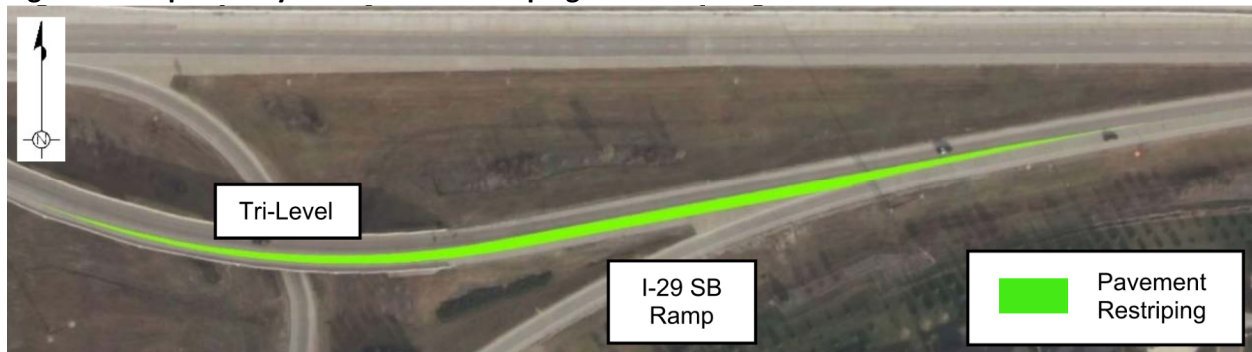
Proposed Layout: Lane Addition, I-29 Ramp to I-94
